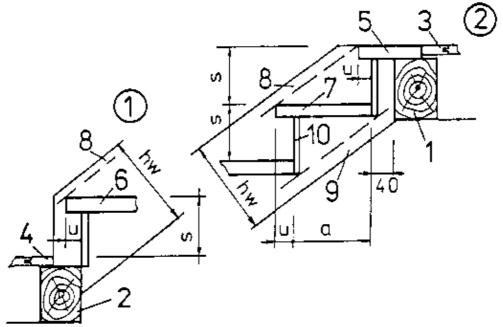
Drawing of the top and bottom string connections at the stair–aprons – (1) bottom connection (2) top connection – 1 lower (bottom) stair–apron, 1 upper (top) stair–apron, 3 floor construction of the top landing, 4 floor construction of the bottom landing, 5 stair head (head step), 6 stair foot (bottom step), 7 step, 8 string top, 9 string bottom, 10 riser, – a tread width, s height of rise, u false tread, h_w string height
